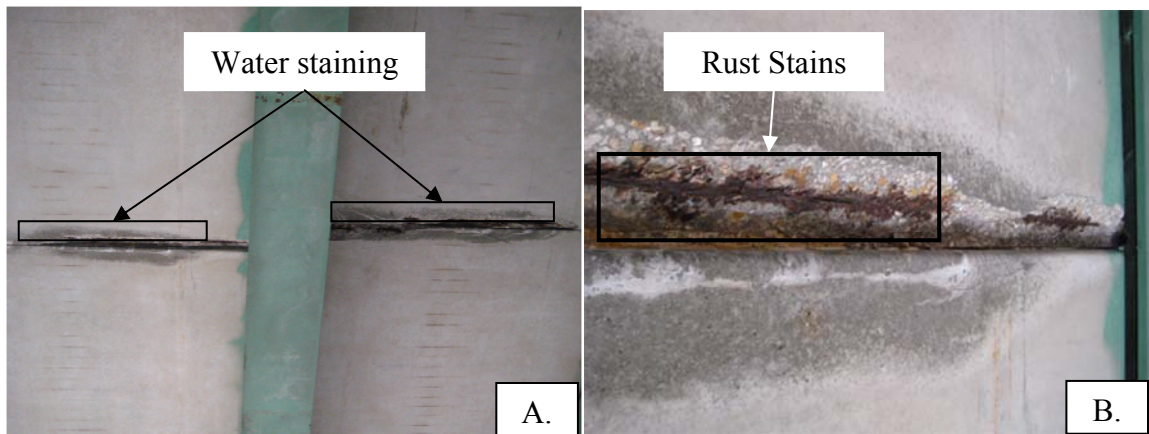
Spalling, Efflorescence, Water Staining and Rust Stains Observed in PPC panels (A. Adjacent panel joints, B. Close-up shot of panel joint) (Bridge A4704)
